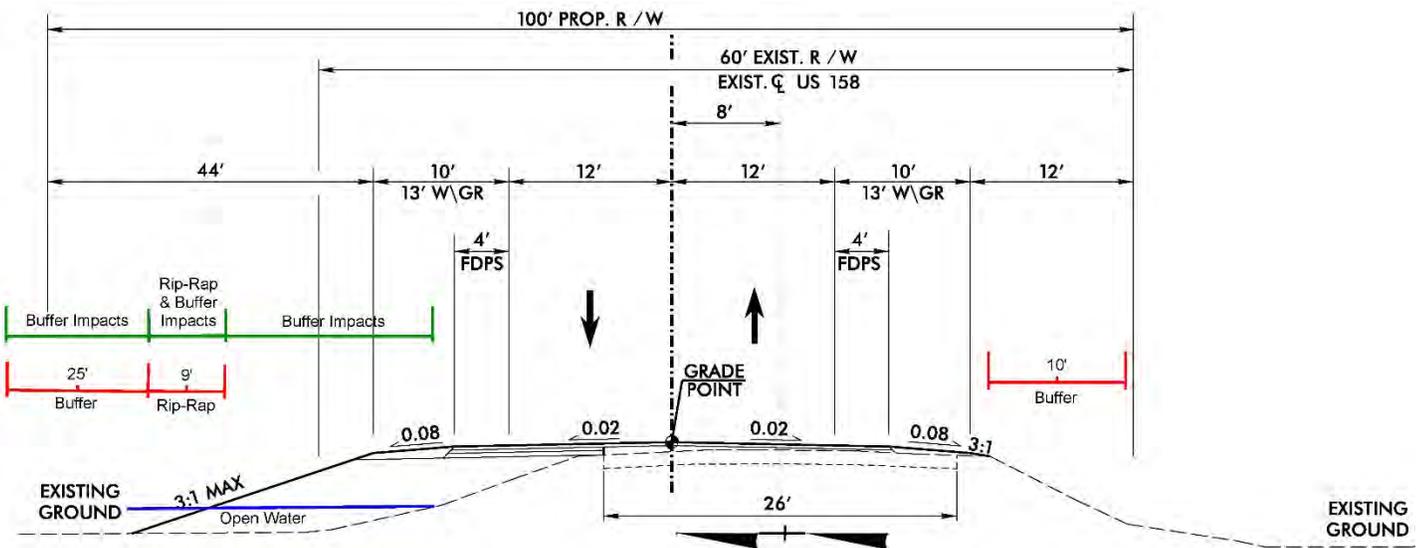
Alternative 2 Proposed Typical Section West of the Refuge
